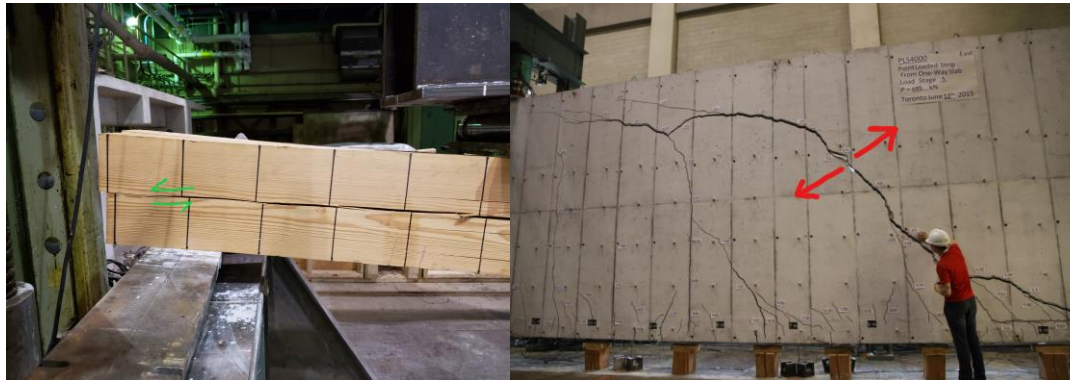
Failures associated with shear stresses – sliding between the fibres of a wooden beam (left) and diagonal cracking in a concrete beam (right)
